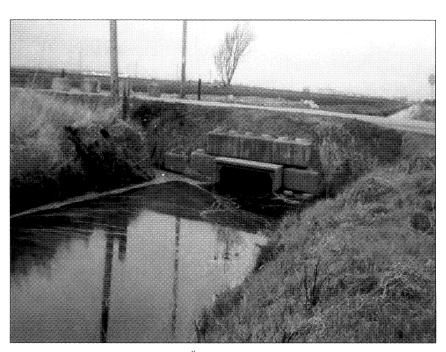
EAST DITCH: Centre Slough at 88th Street (view facing east)
